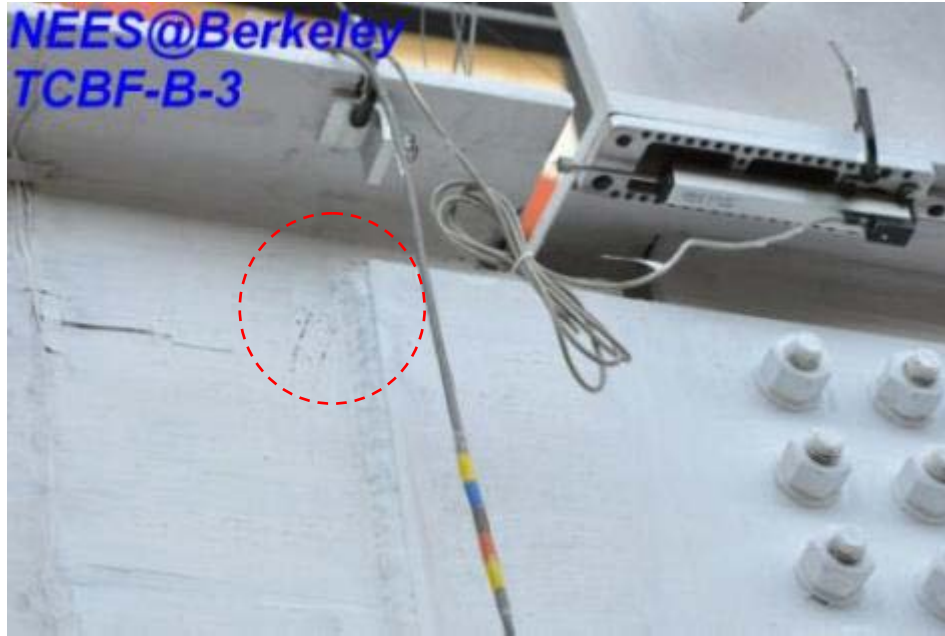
Local flaking of whitewash developed in the lower beam web near beam-to-gusset splice plate
